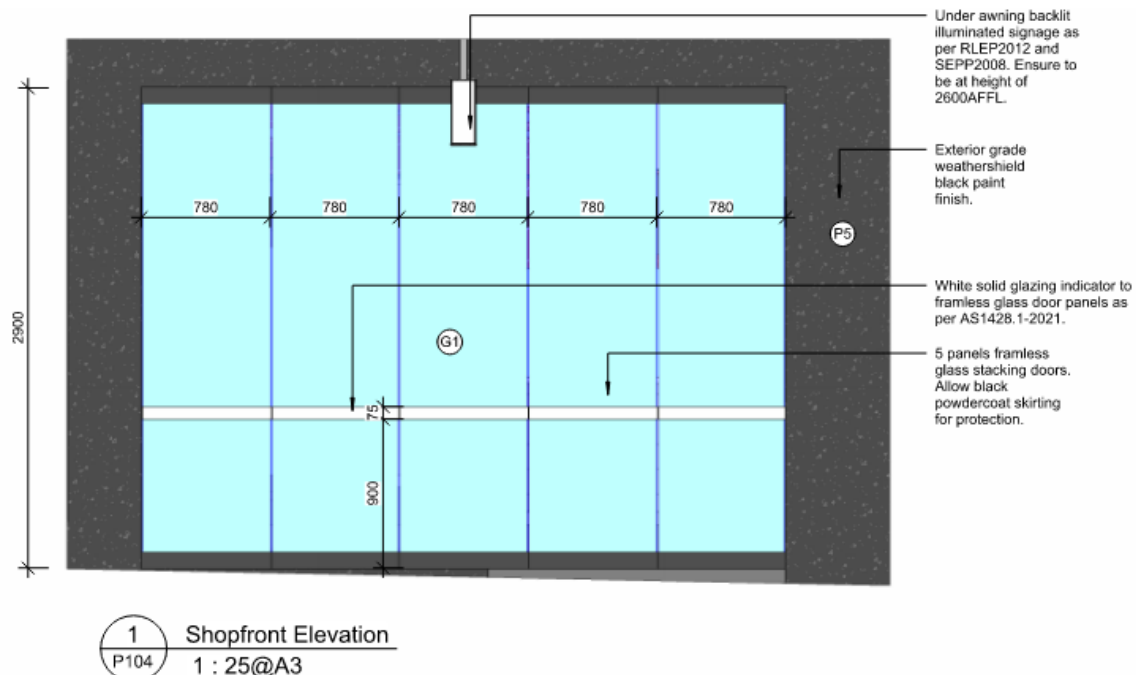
Street (south) elevation plan (Source: Liteco Studio)
